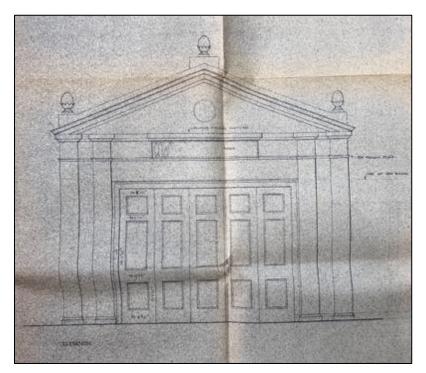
Proposed south elevation of 12A Park Village West as per drawing 40/10 by John Burkett ARIBA, 1958 (National Archive Ref CRES 35/3545)
